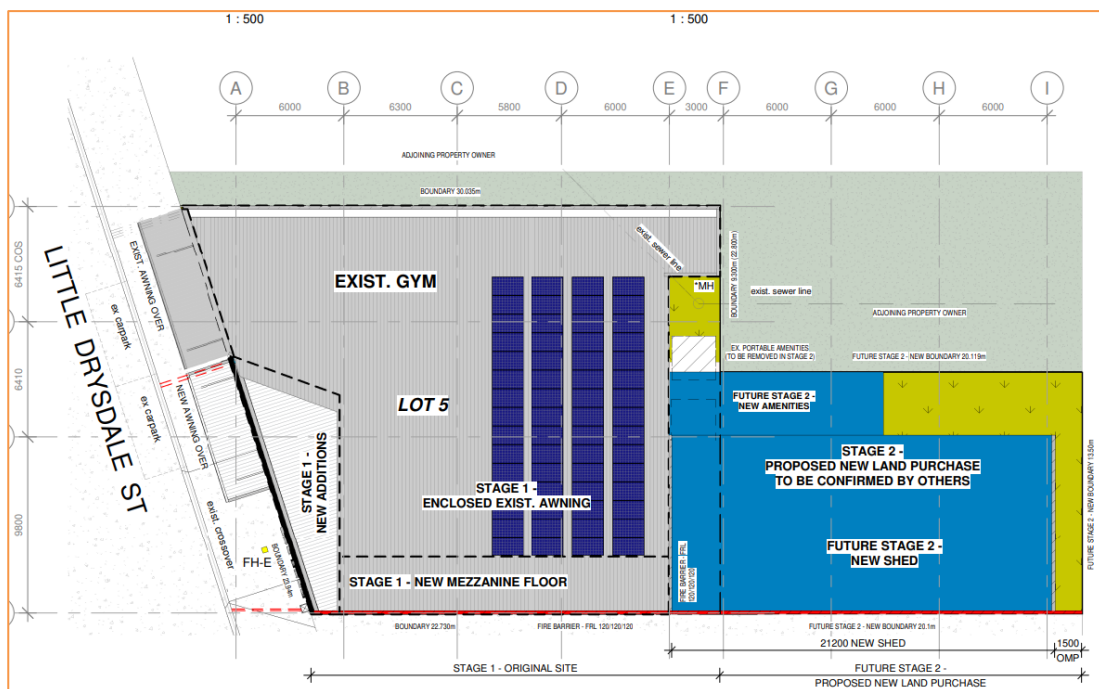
Proposed site plan. Source: Burdekin Building Design.
